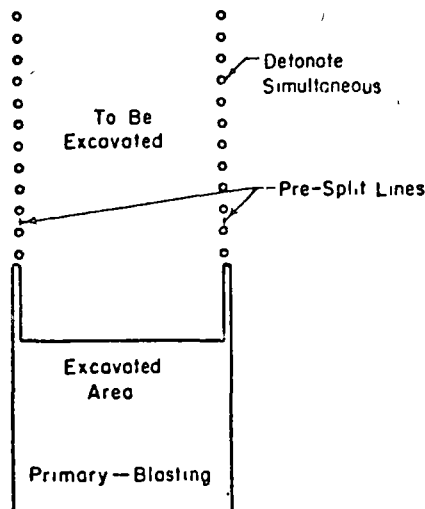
Typical Layout for Presplit Holes (After DuPont Blasters Handbook, 1966)
